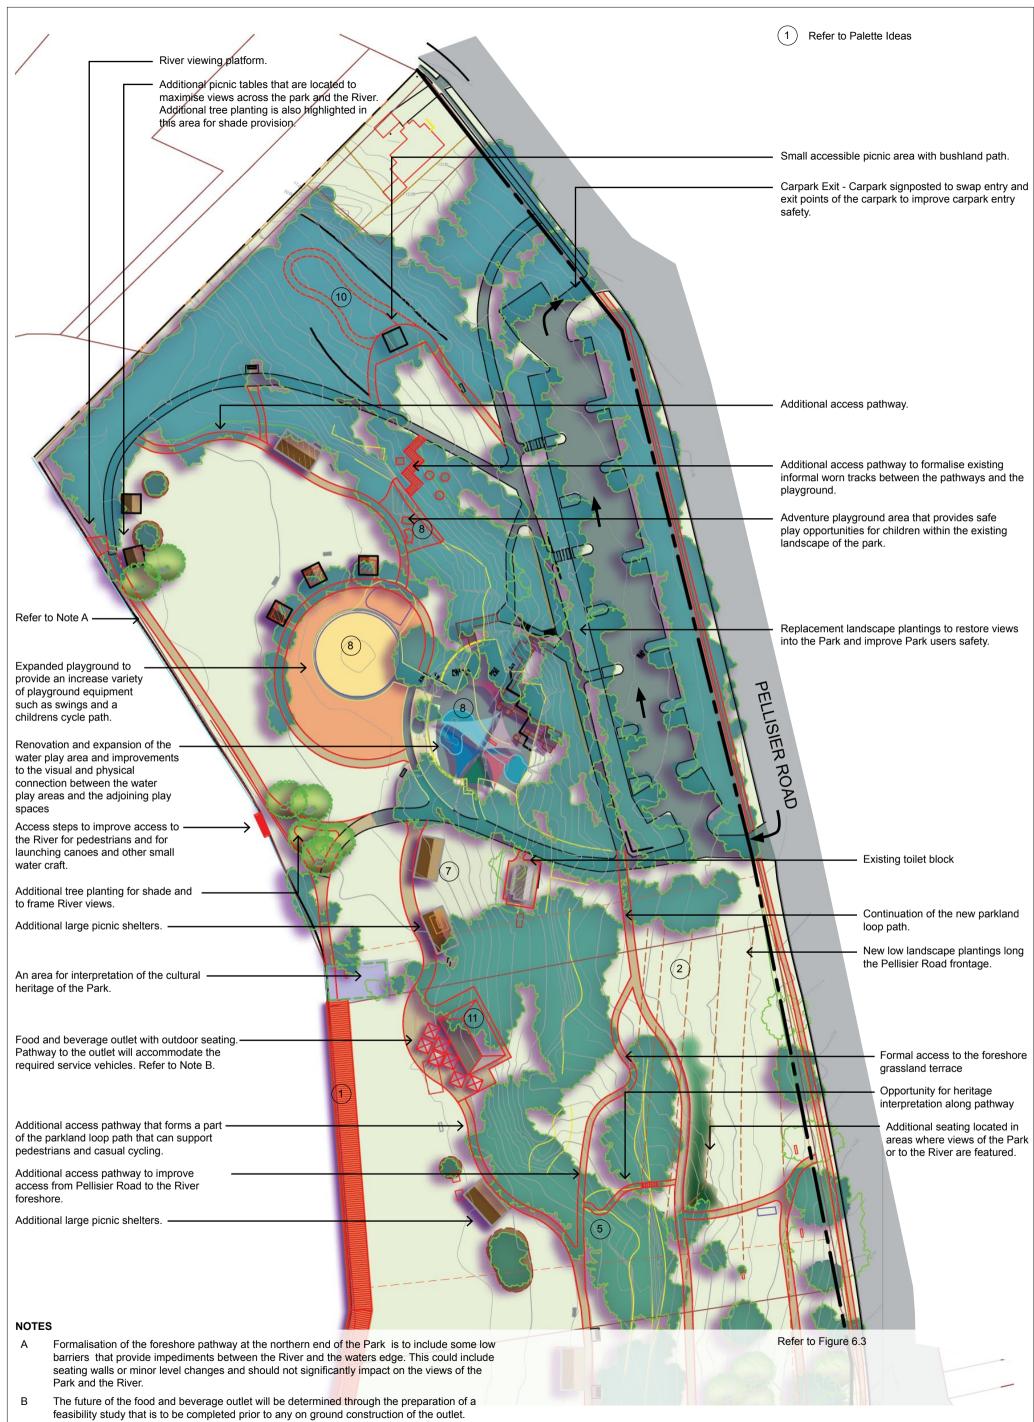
Putney Park Masterplan - Detail with Notes - North
